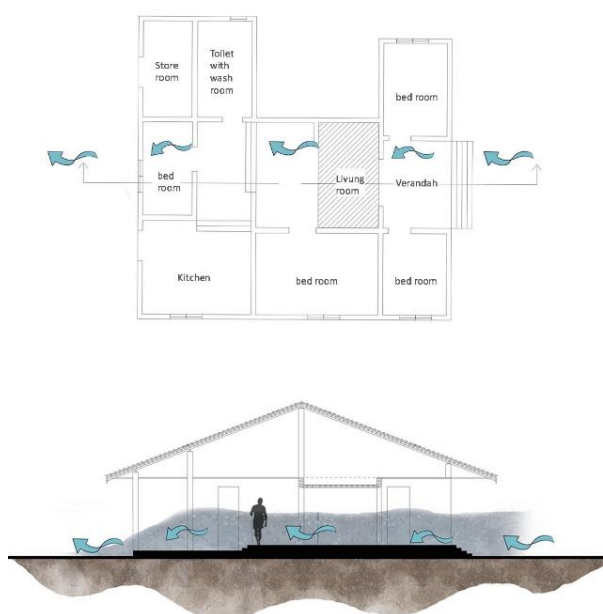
Floor Plan and Cross Section showing movement of flood water and level of inundation in Case 3 (Source: Henarangoda, 2020)
